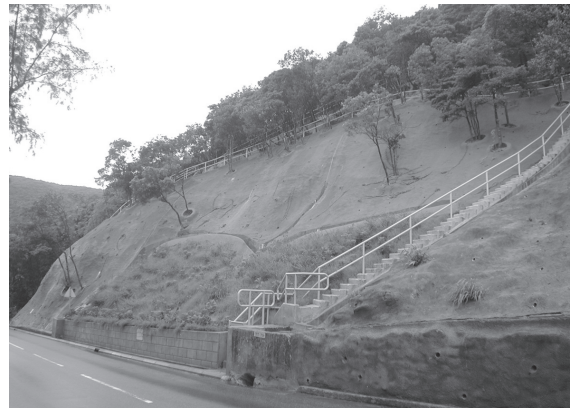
Typical concrete staircase and metal railings for slope access and maintenance
